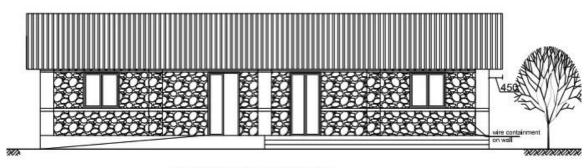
Typical two-rooms and three-rooms building plans for proposed designs (Stone Masonry).
